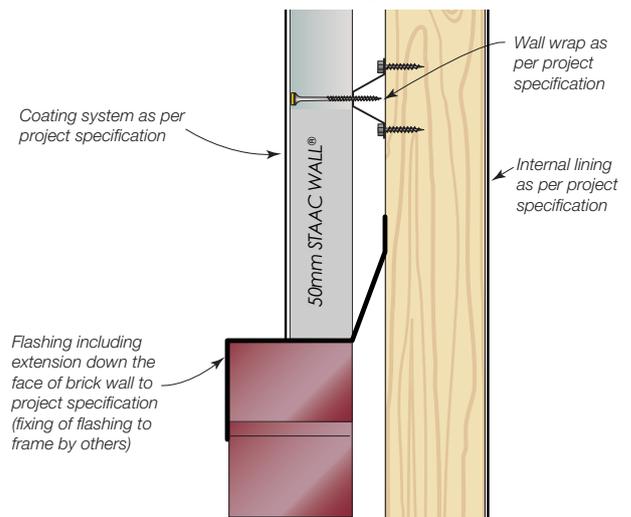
Horizontal control joint – Cavity brickwork to STAAC WALL®
